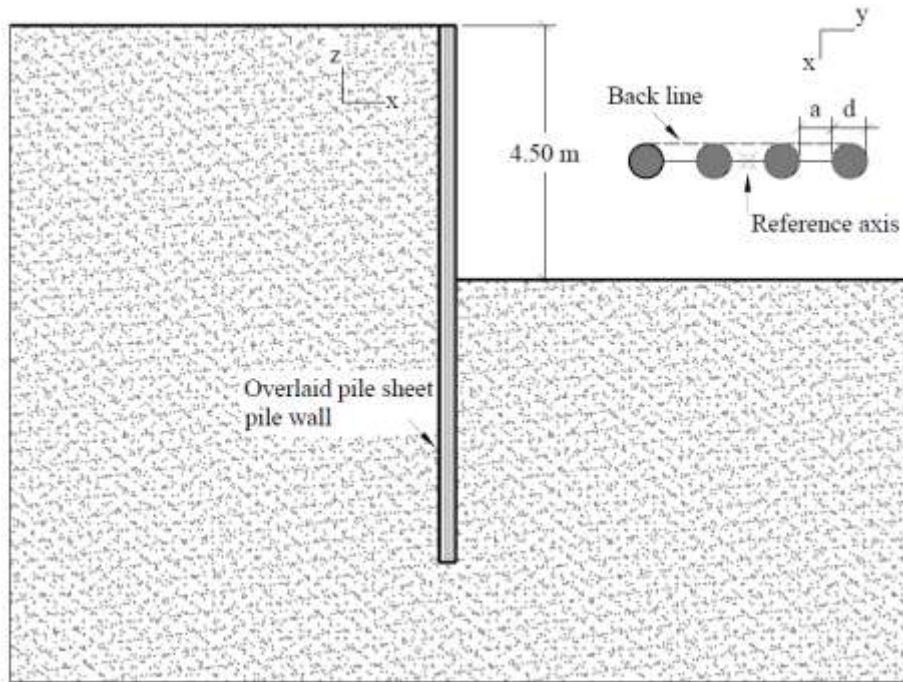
Cross section for the analyzed cantilever sheet pile walls.
